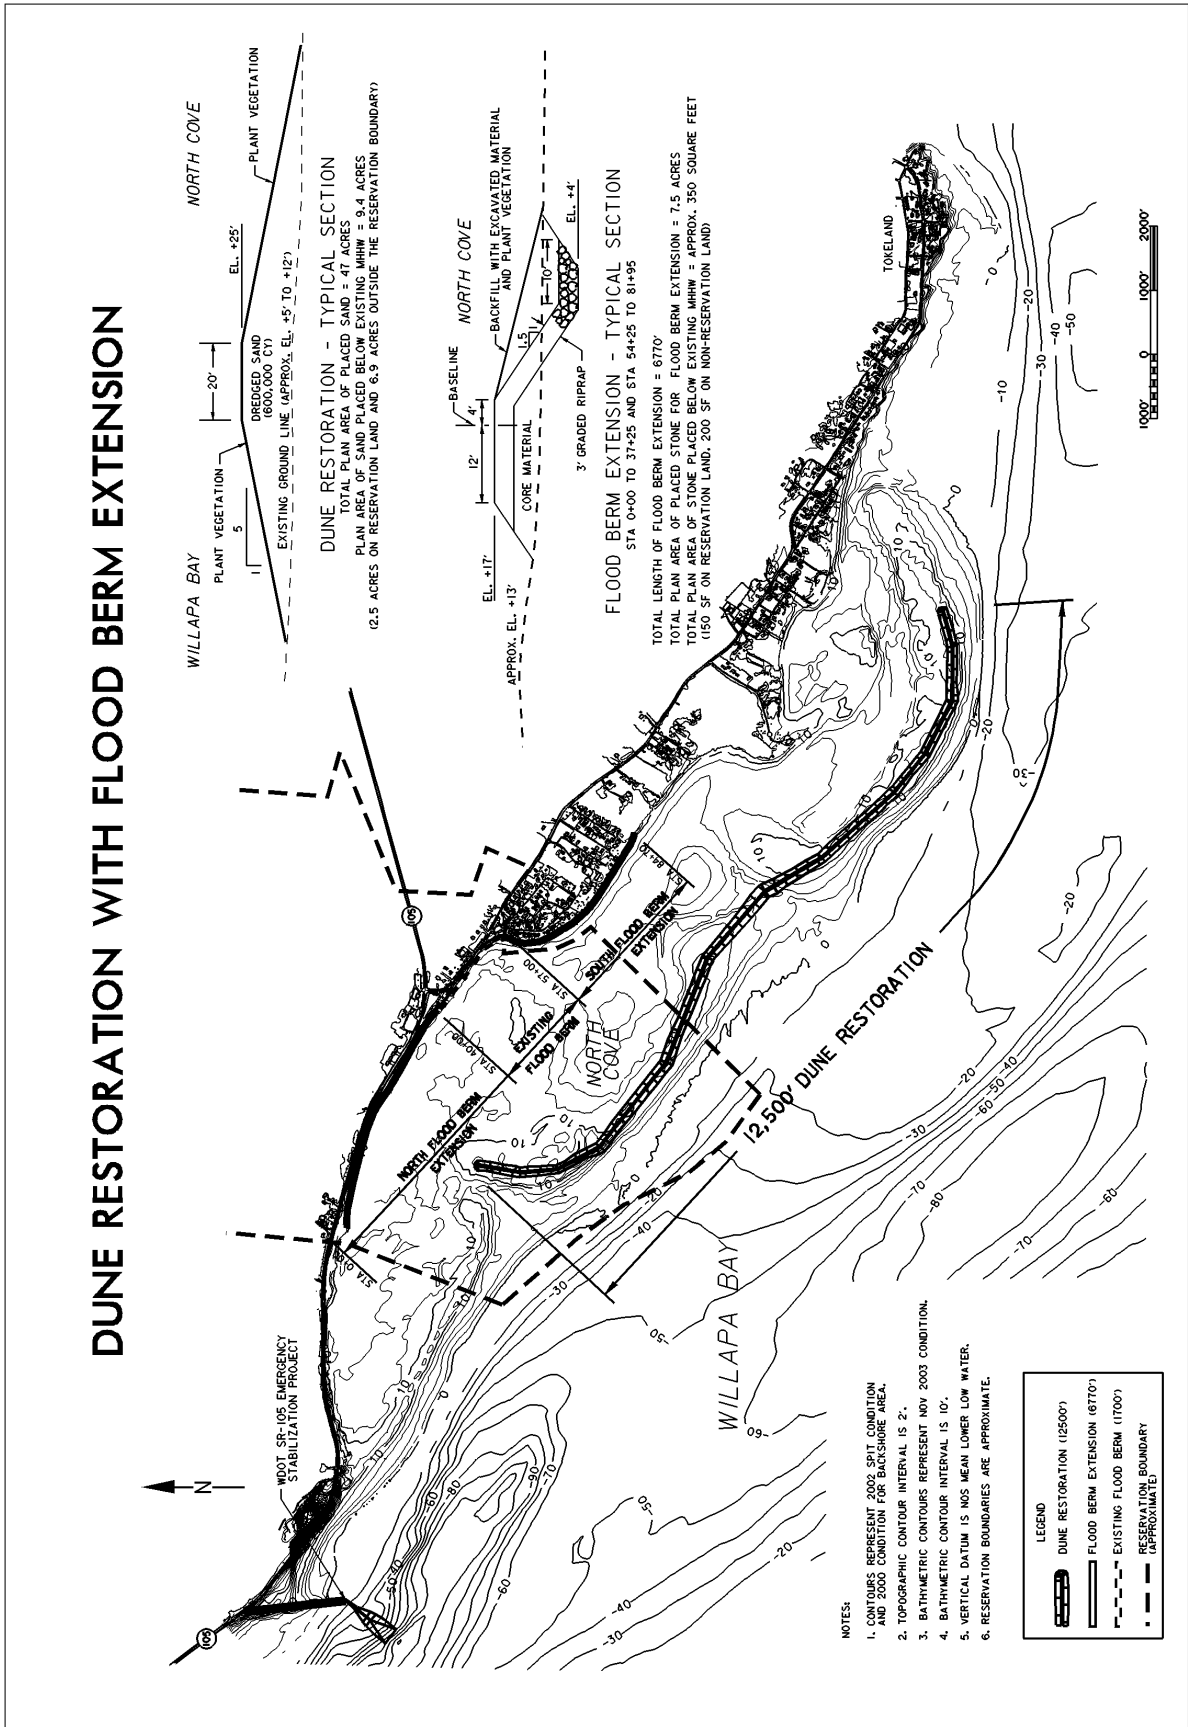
Barrier dune restoration with flood berm extension, plan and sections.
